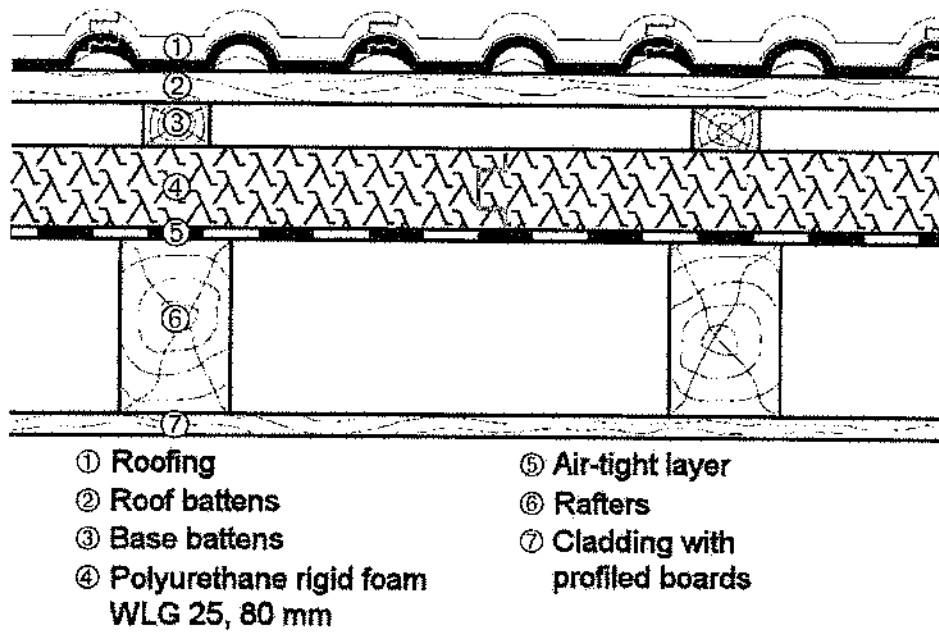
Polyurethane pitched roof insulation with an air-tight layer above the rafters
